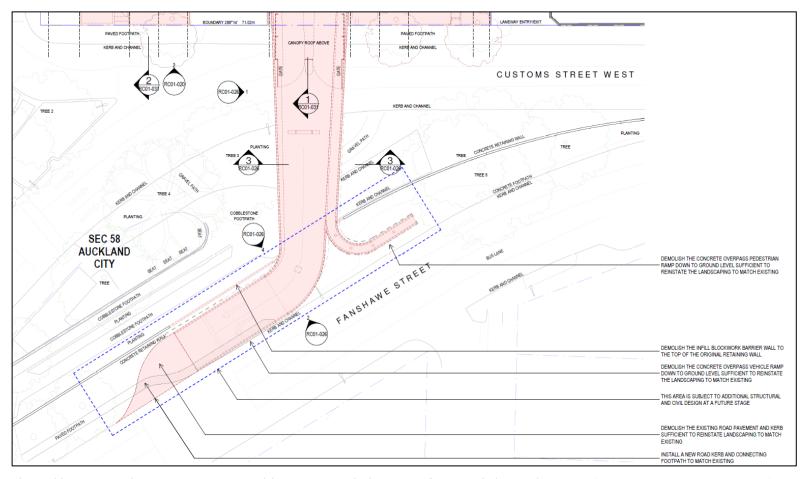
Plan showing the proposed demolition and remediation works for the existing vehicle ramp (source: Warren and Mahoney)
